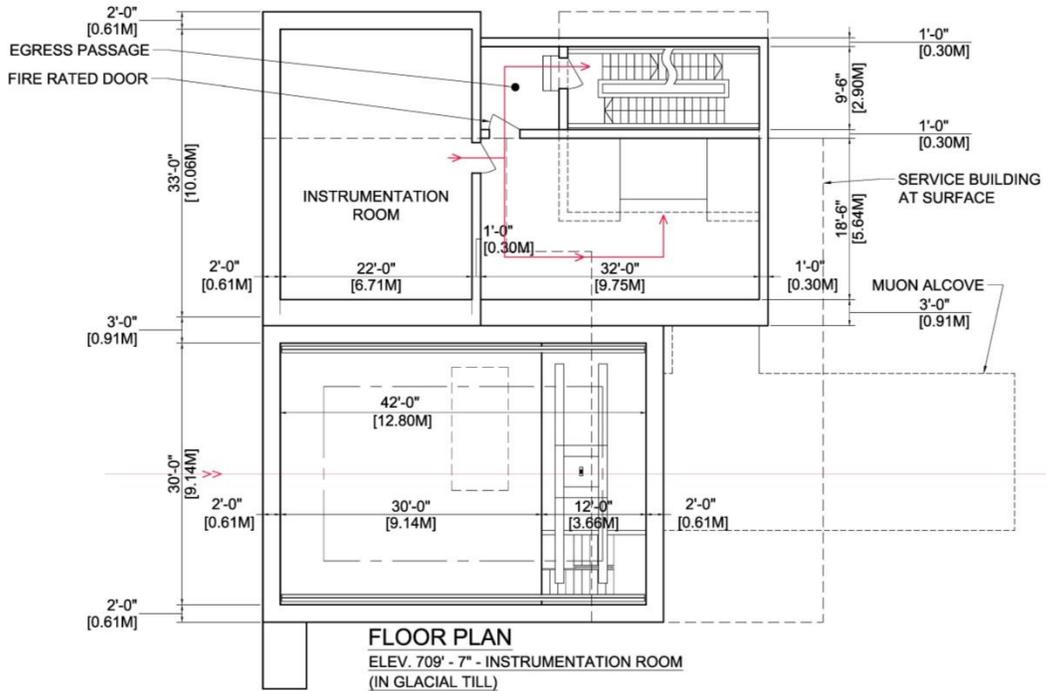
Absorber Hall, Instrumentation Room: Upper Level, Egress Routing.
